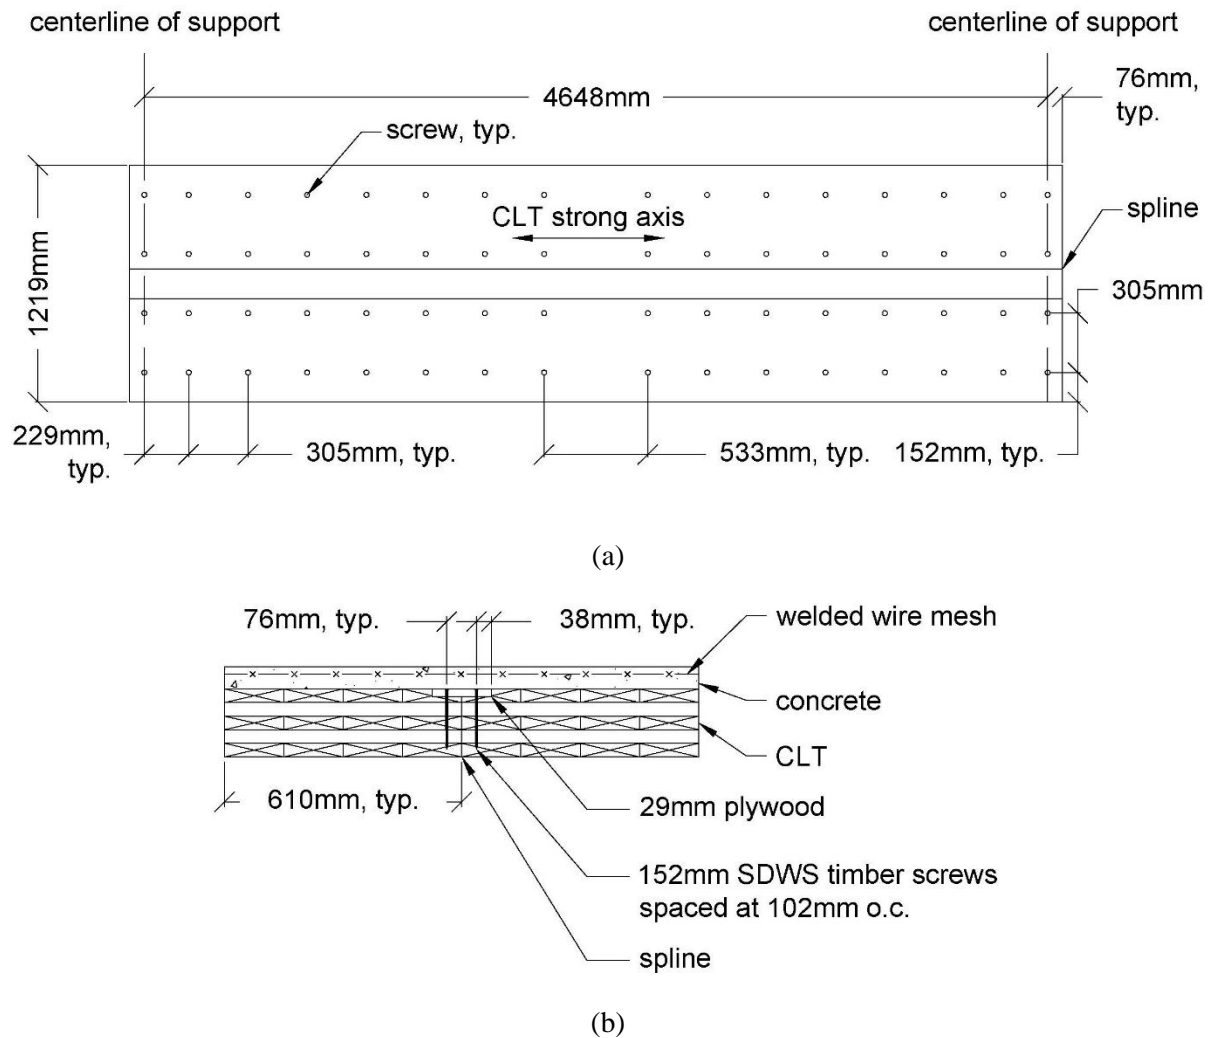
CLT-concrete composite floor layout (a) plan view showing shear connector layout and (b) section through the spline joint detail
